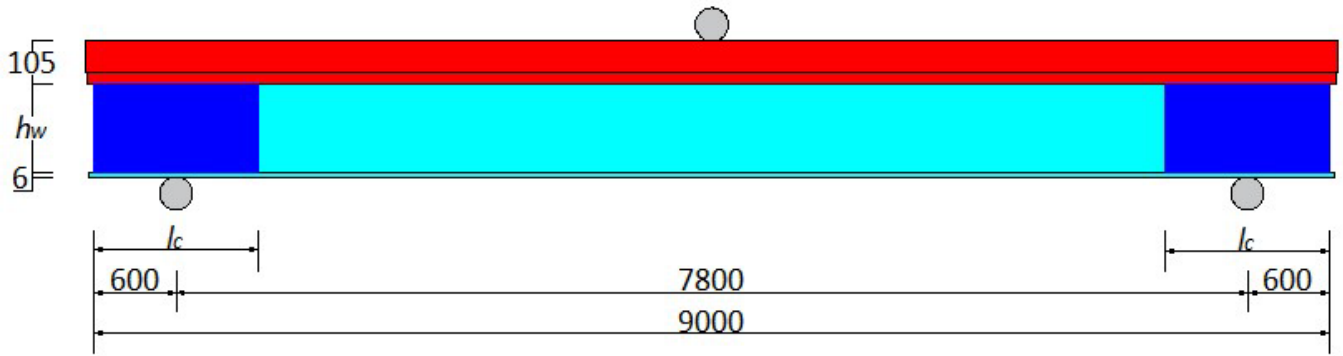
Elevation of pilot MVFT girder (unit:mm).
